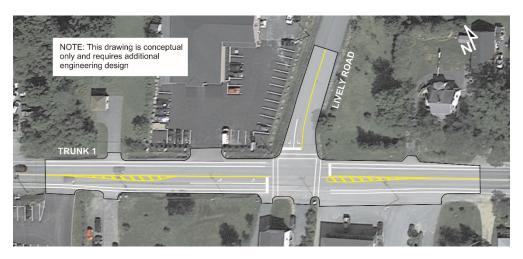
Conceptual Layout of Lively/Trunk 1 Intersection
